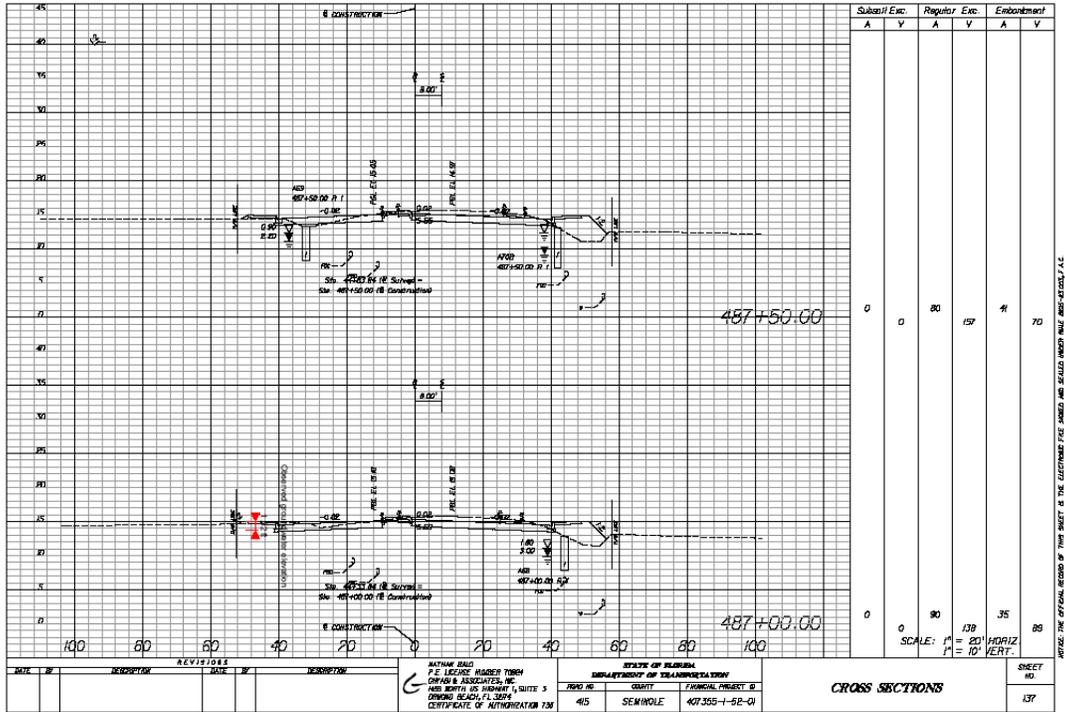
Station 487+00 cross section showing ground water measurement collected from sidewalk grade at a depth of 1.32 feet below grade.
